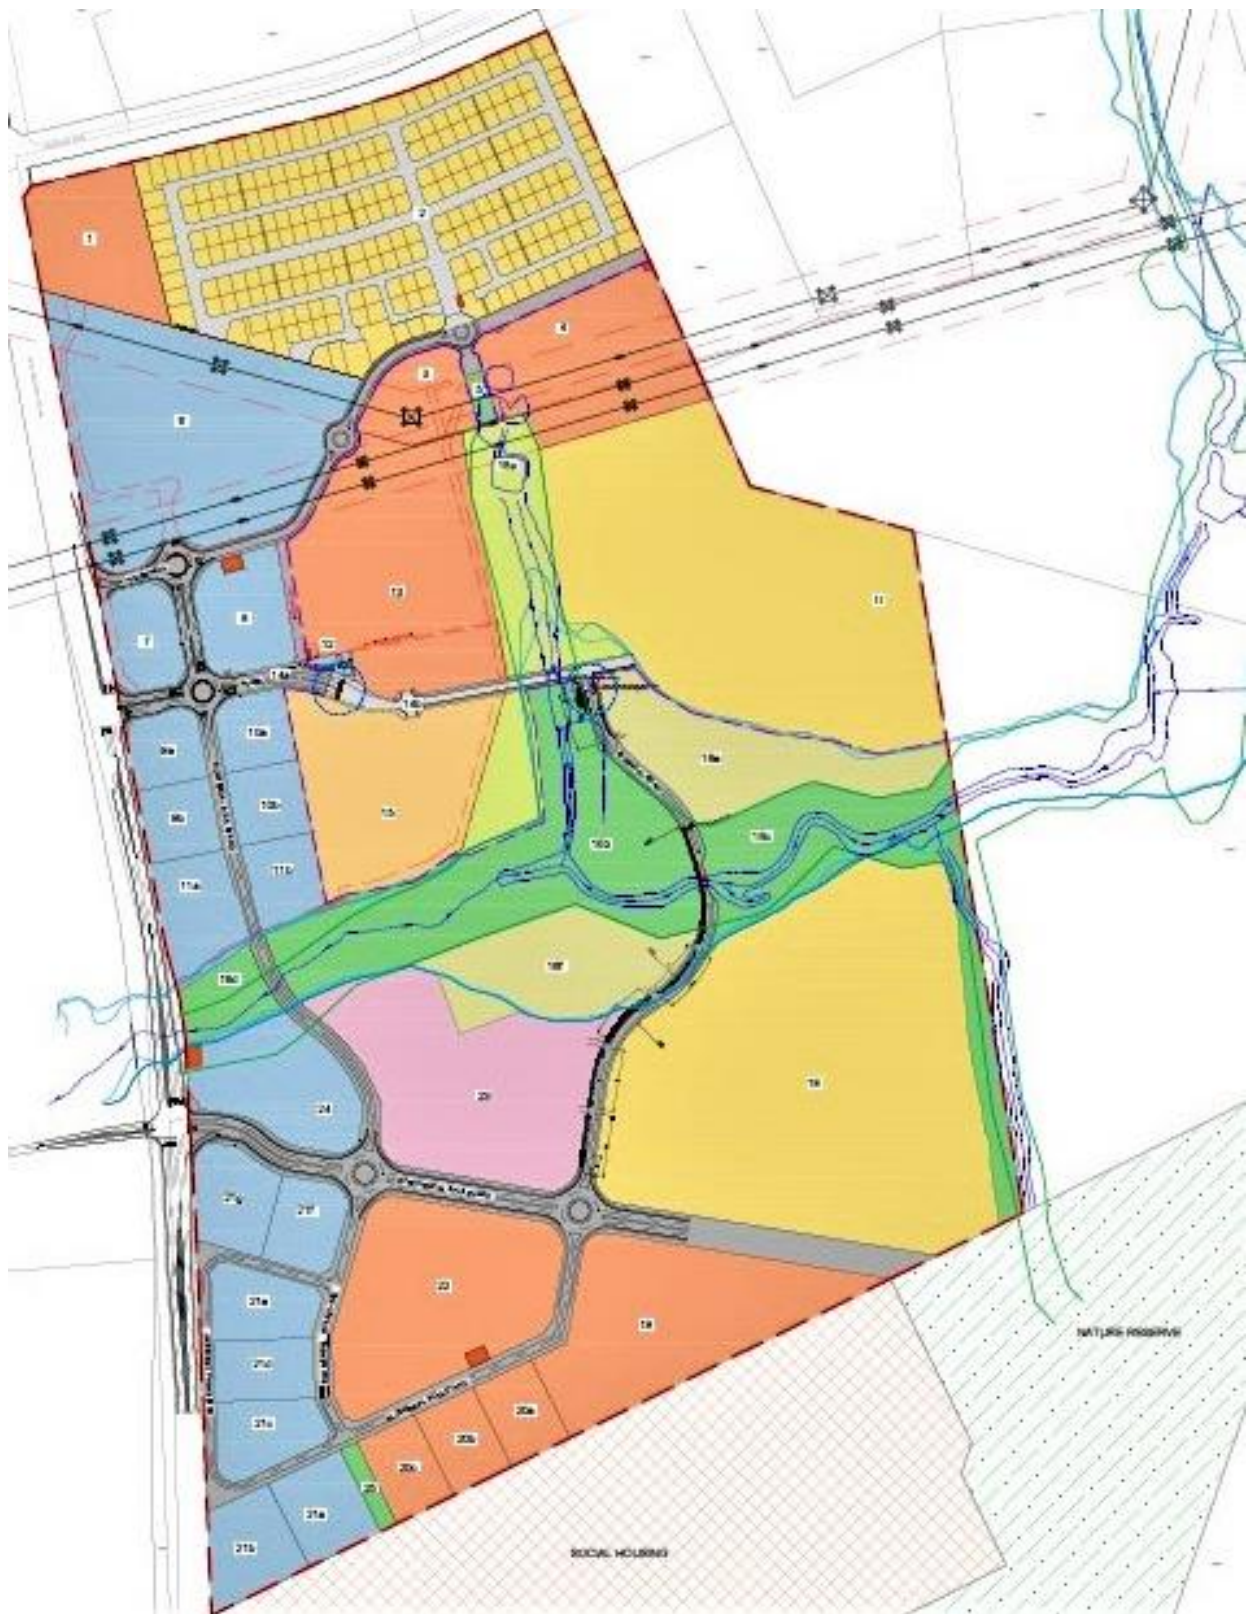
Proposed layout plan for the site (Elco Property Developments, 14 October 2019)
